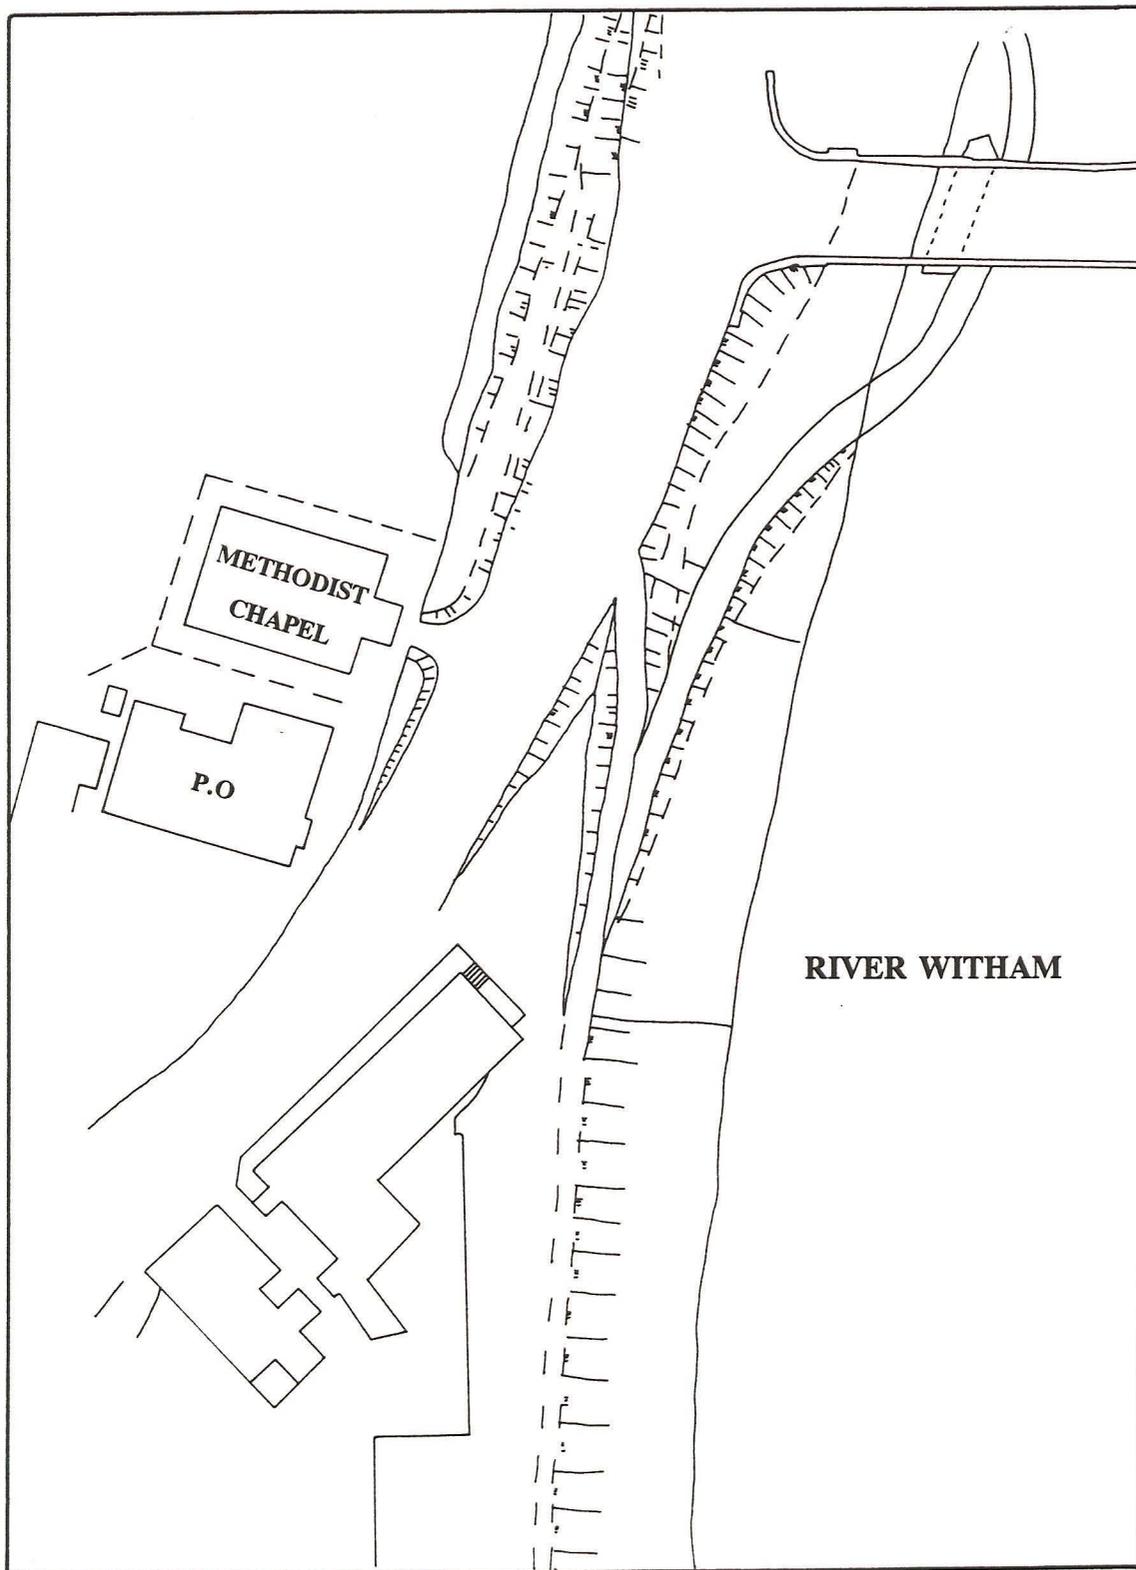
Extract from construction plans for Langrick Bridge, 1906
